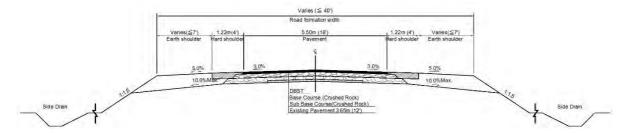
Typical Cross Section in Flat Region (MoC-05 / Bituminous Road (DBST): 5.5m)
